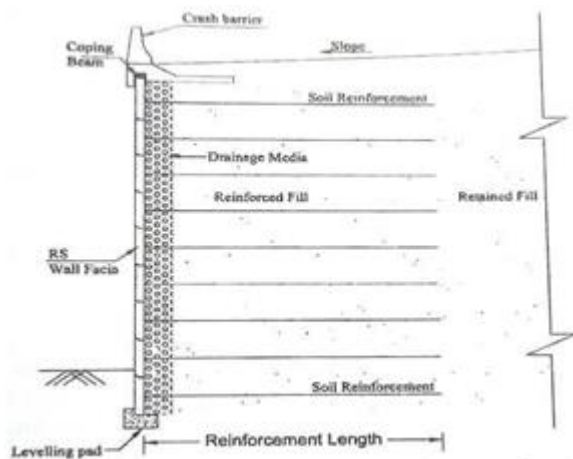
shows the elements of a reinforced soil retaining wall. In addition, following section describes the elements.
